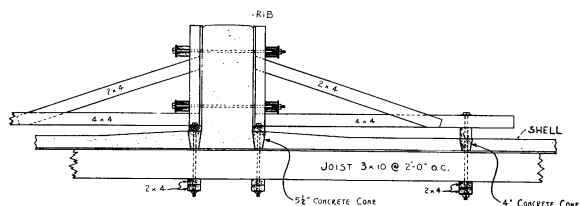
Detail of forms, bracing, and supporting devices for roof shell and rib
